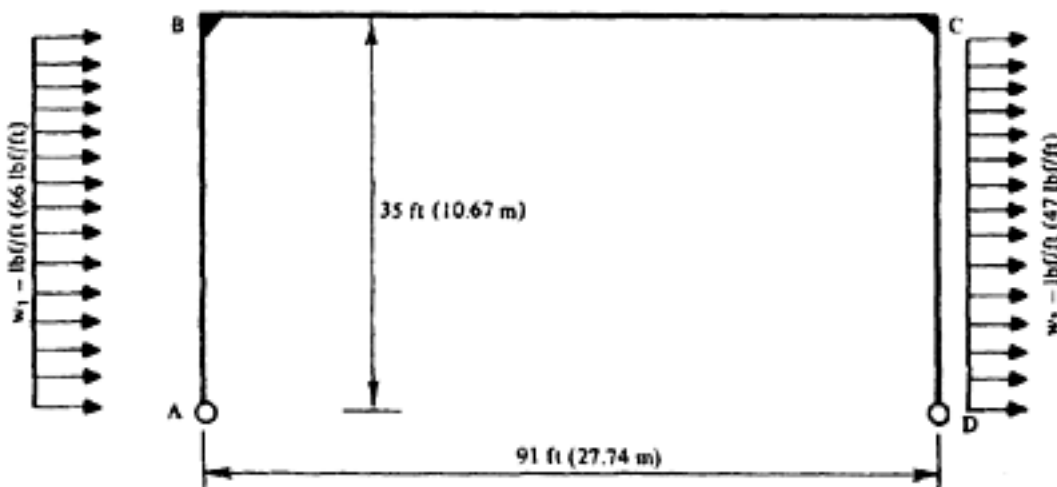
Wind loading on the portal (example 14.8.1 stage 4)
